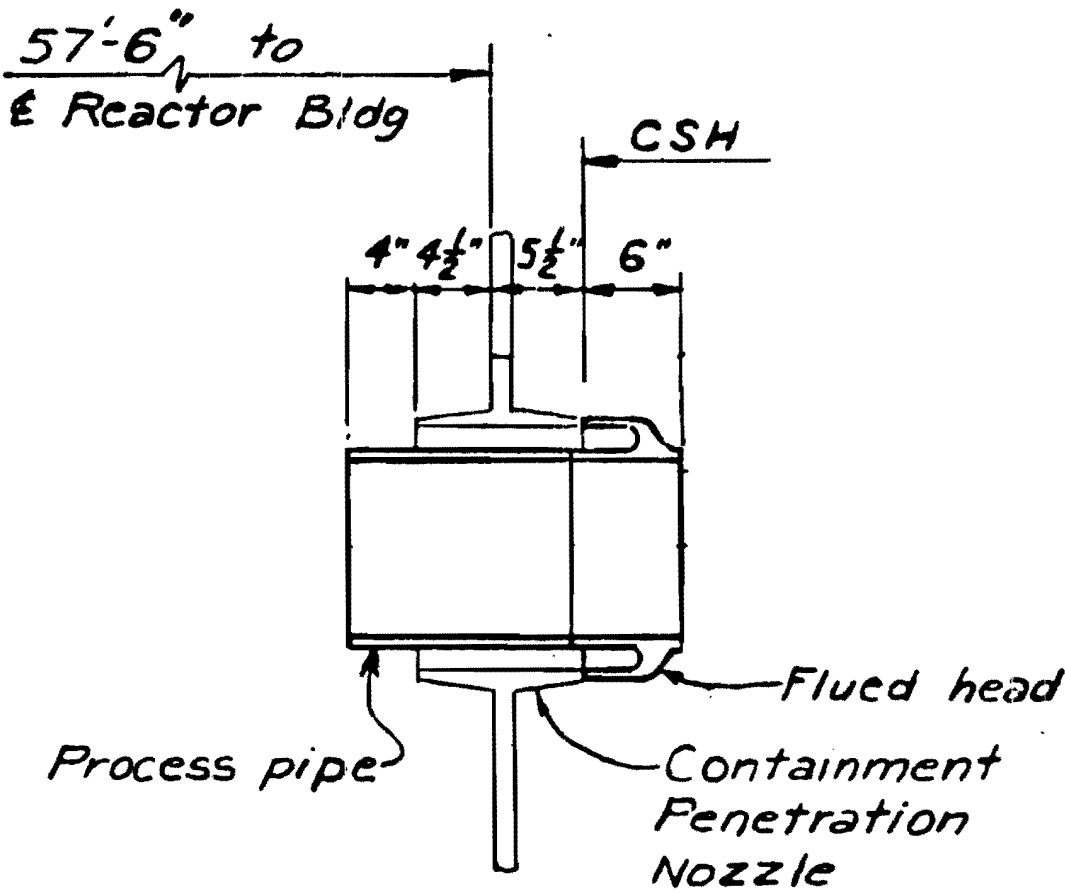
Type VIII, for Butt Weld C.S. Process Lines
